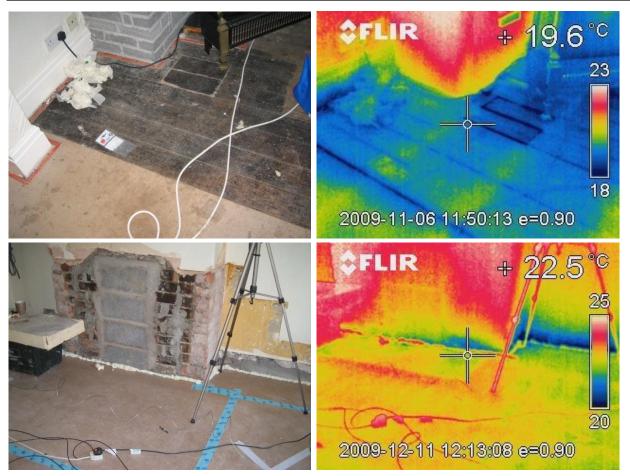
Infiltration, under depressurisation, through the original suspended timber ground floor following the 1st coheating test was addressed for the 2nd coheating test with a temporary floor covering.
